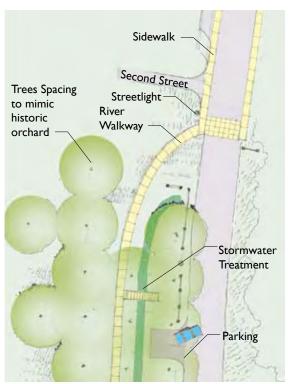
Plan Enlargement at Second Street and Boones Ferry Road
